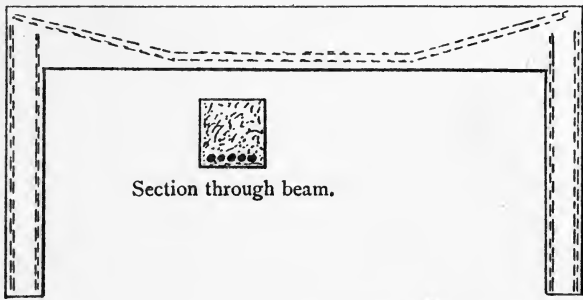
Reinforced concrete beam, supported on two reinforced concrete columns; the dotted lines show the "reinforcement" of steel rods.
